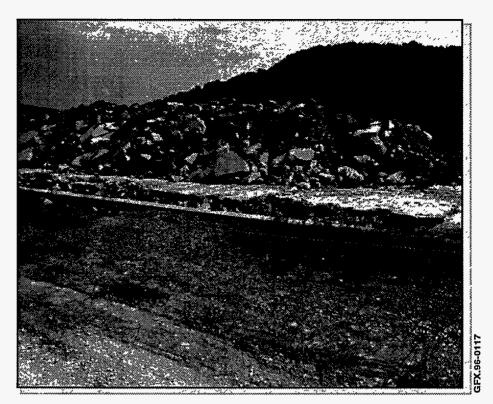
Contaminated Concrete Rubble Pile.
